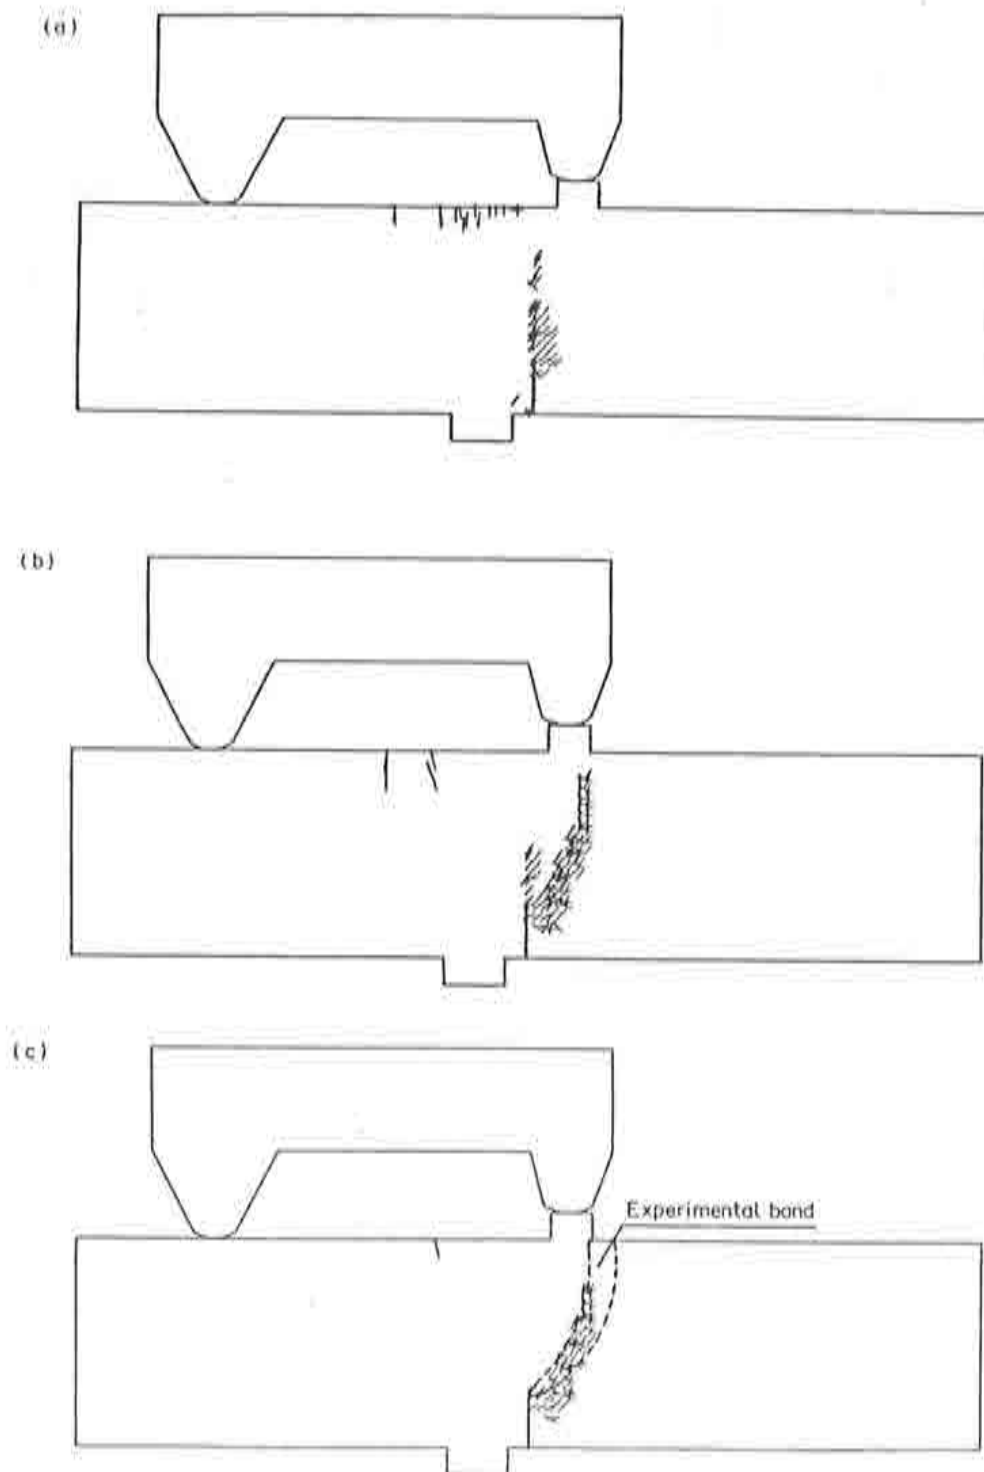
Notched beam (mixed mode). Distribution and localization of cracking
